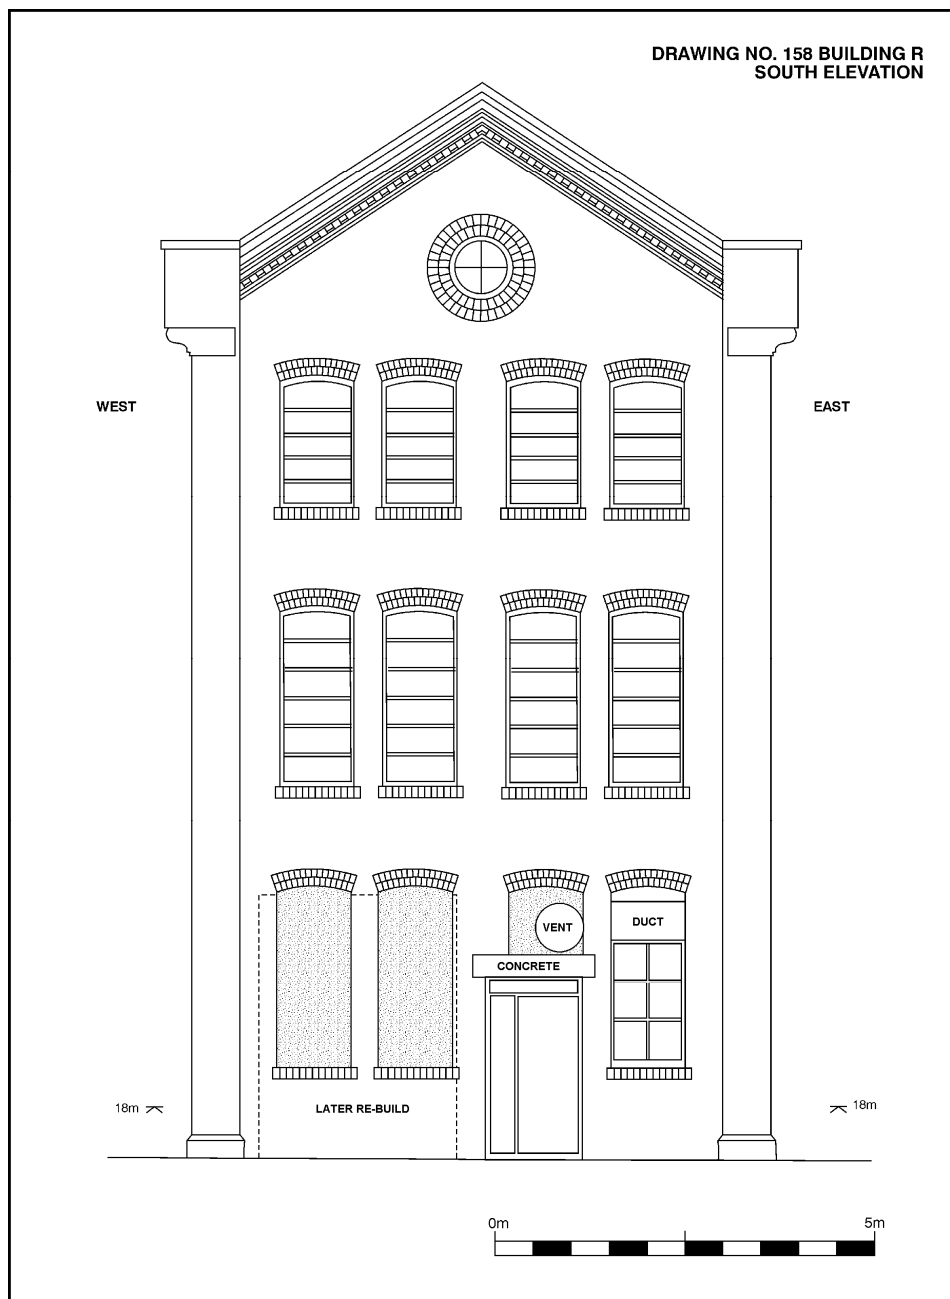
Survey drawing of the south elevation of Building R (scale 1:100)
